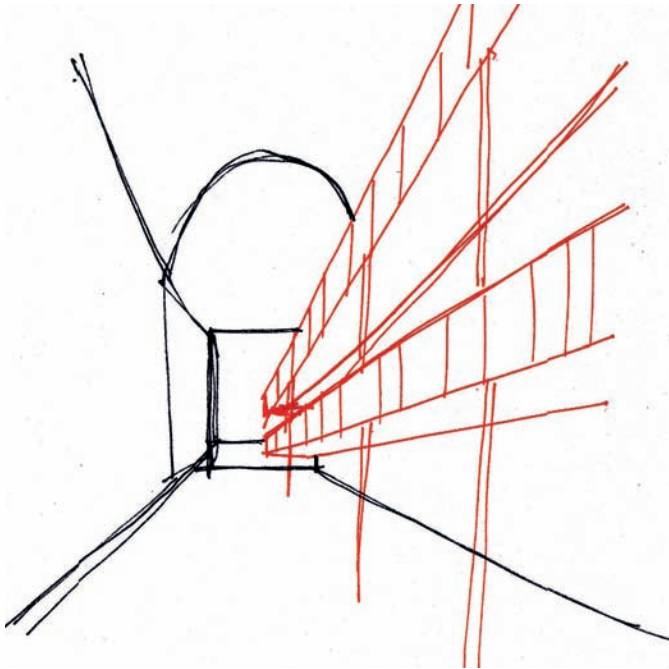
A new steel mezzanine structure inside the existing with new double volume space for exhibition opportunities.
